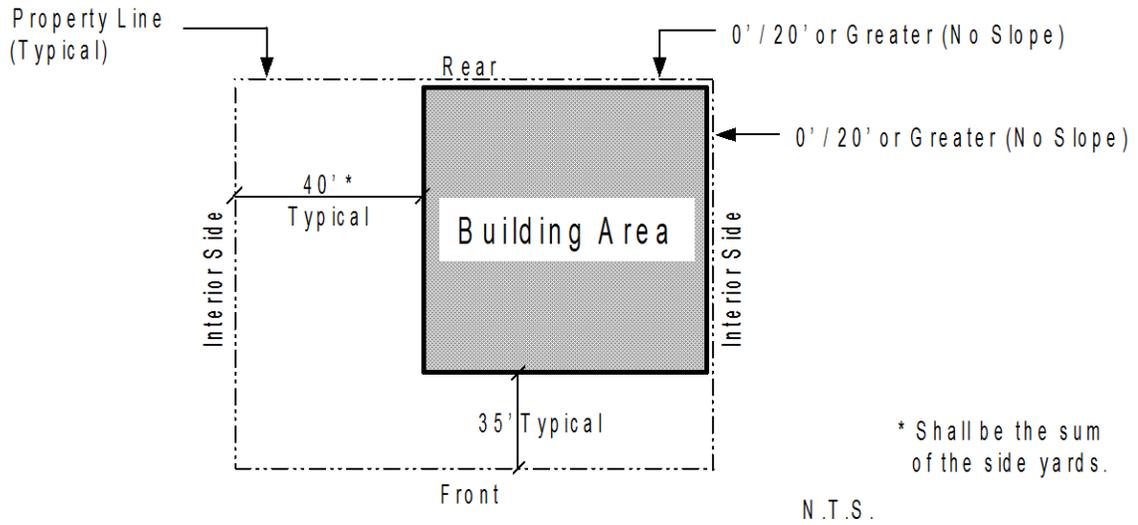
BUILDING SETBACK – INTERIOR PARCEL
